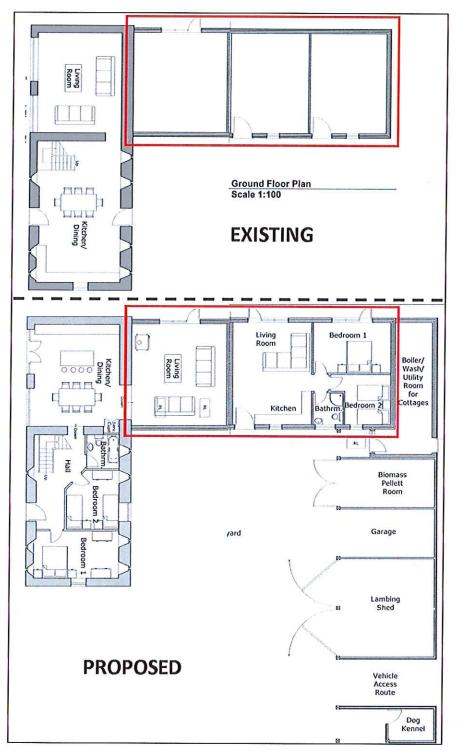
Existing and proposed floor plans highlighting the building surveyed
